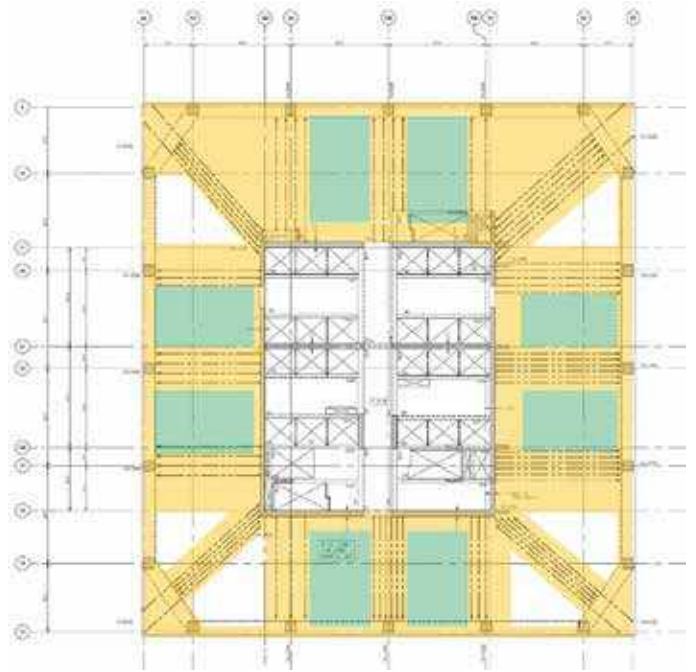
Plan of typical high-rise (tower) level (Note: Green designates area of future stair opening, additional slab reinforcing is required; yellow designates no future slab penetration is these areas, limited small sleeves may be allowed; and white designates area for small penetration, sleeves, and poke-throughs)
